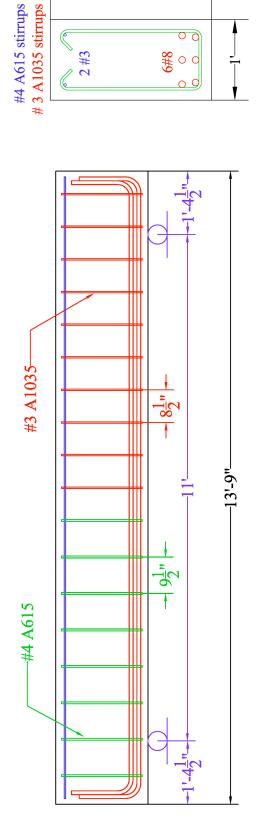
Elevation and Cross-Section Details for Specimen SR1
